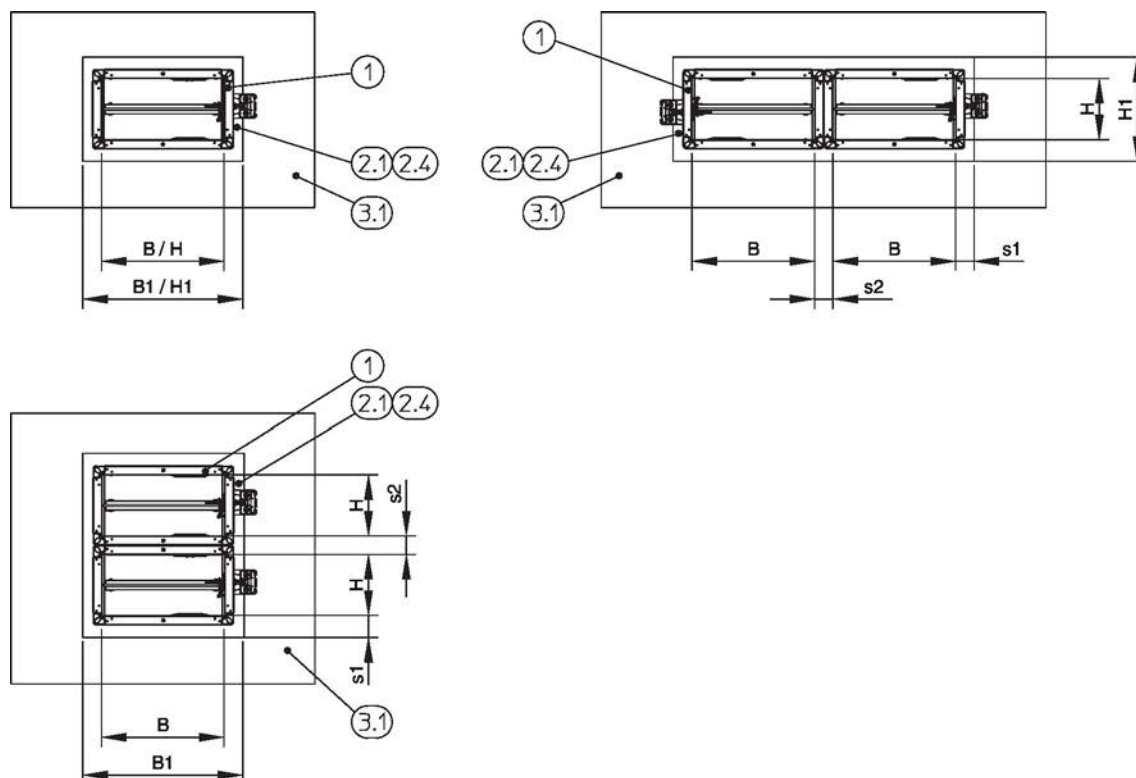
Dry mortarless installation with fire batt into a solid wall
